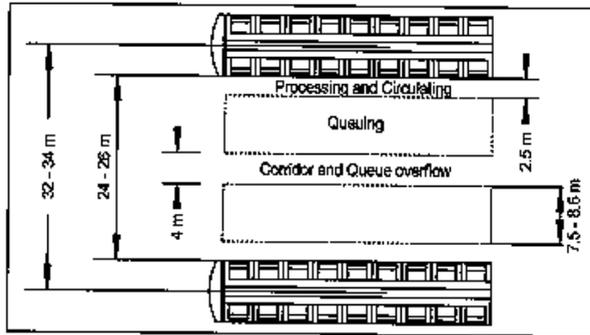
Recommended dimensions for Island Type Check-in Layout with single queue per flight (maximum queuing time of 30-35 minutes)
